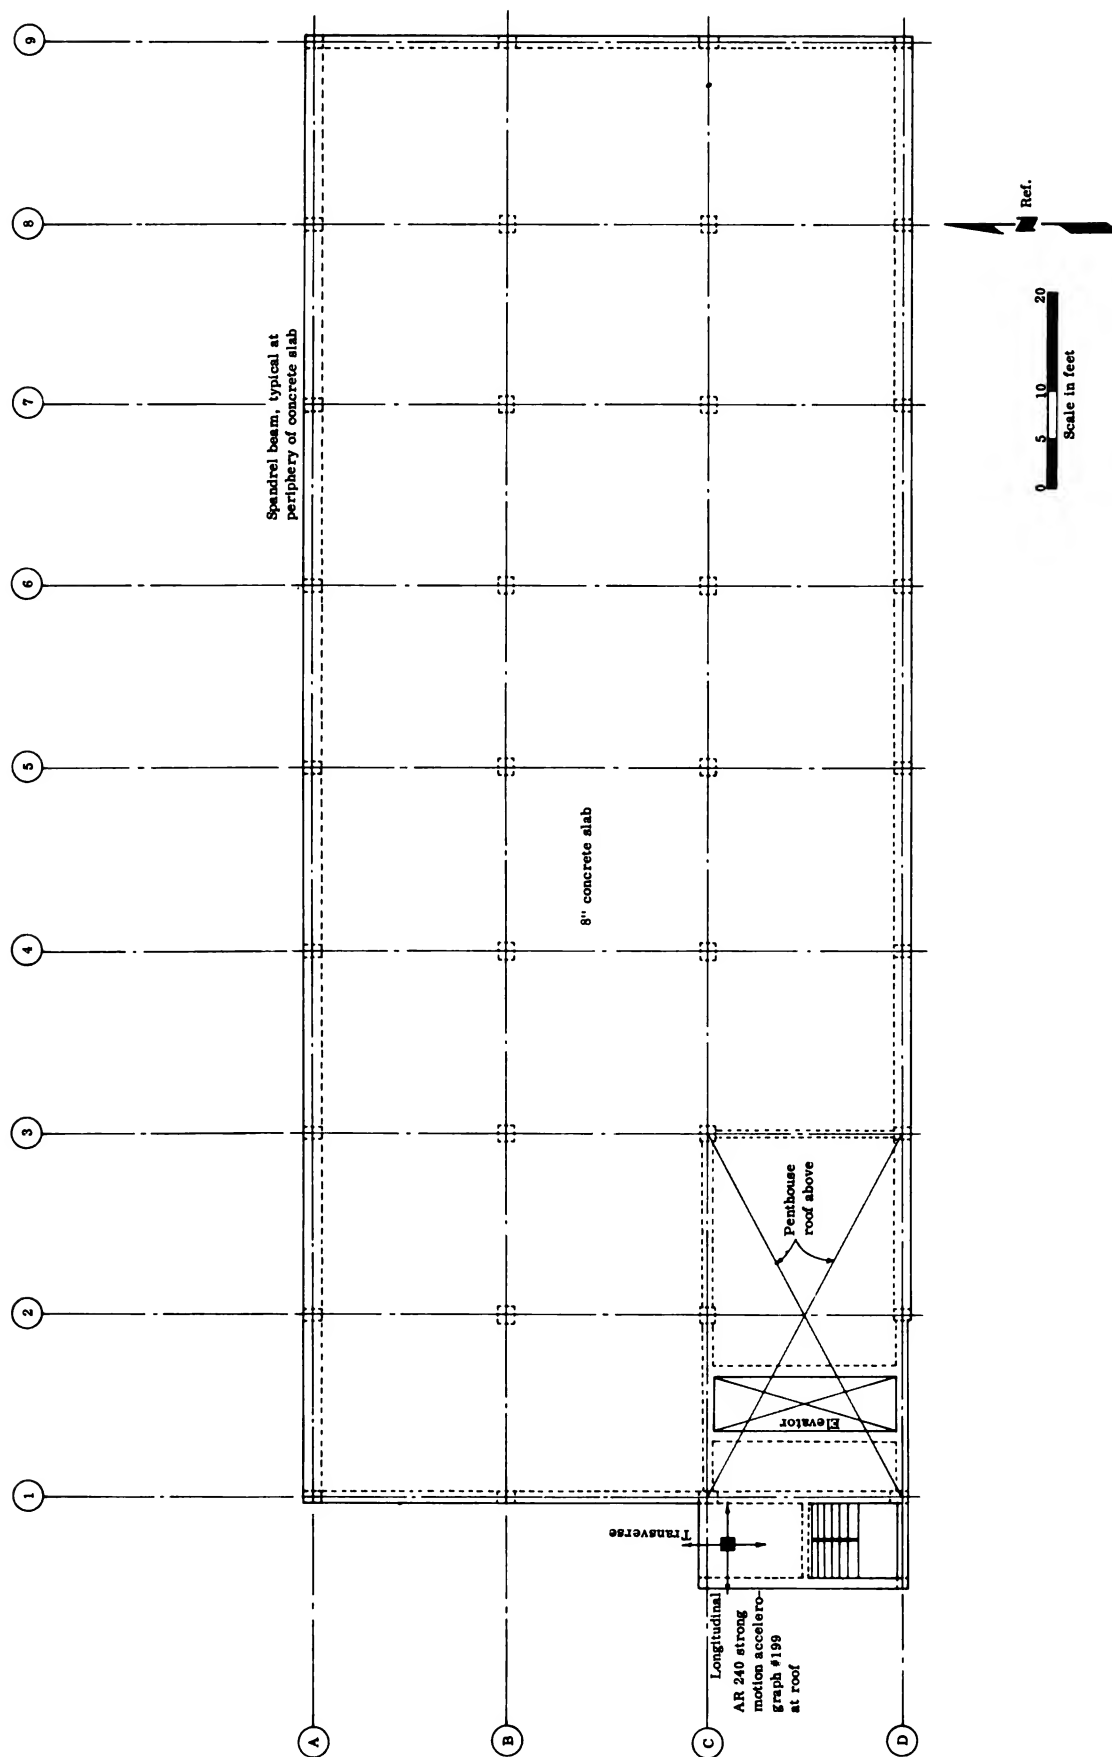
Holiday Inn, Orion Avenue. Roof framing plan.
